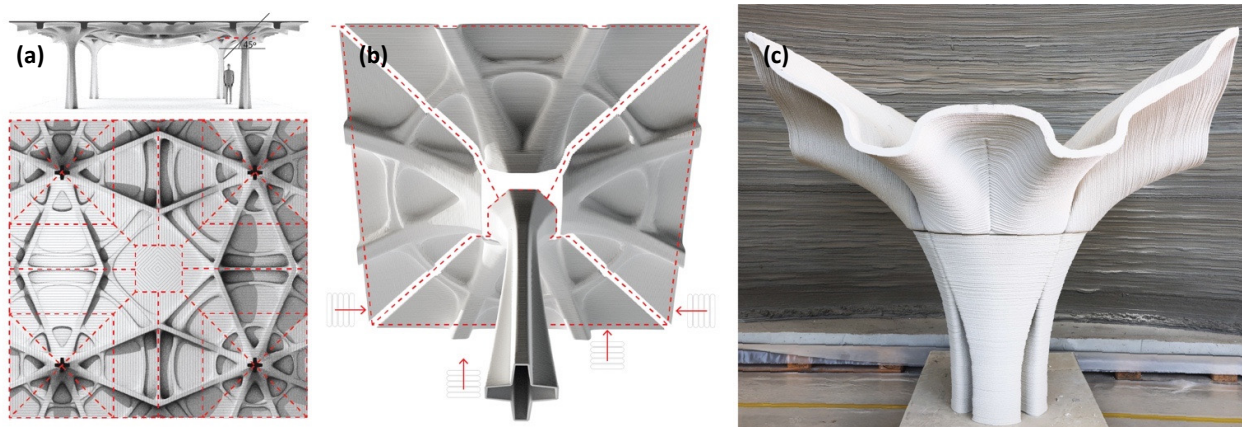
Ribbed slabs with 3D concrete printed formwork: (a) visualisation of the designed ribbed slab; (b) segmentation of the column to slab connection; (c) prototype of the column to slab connection.
